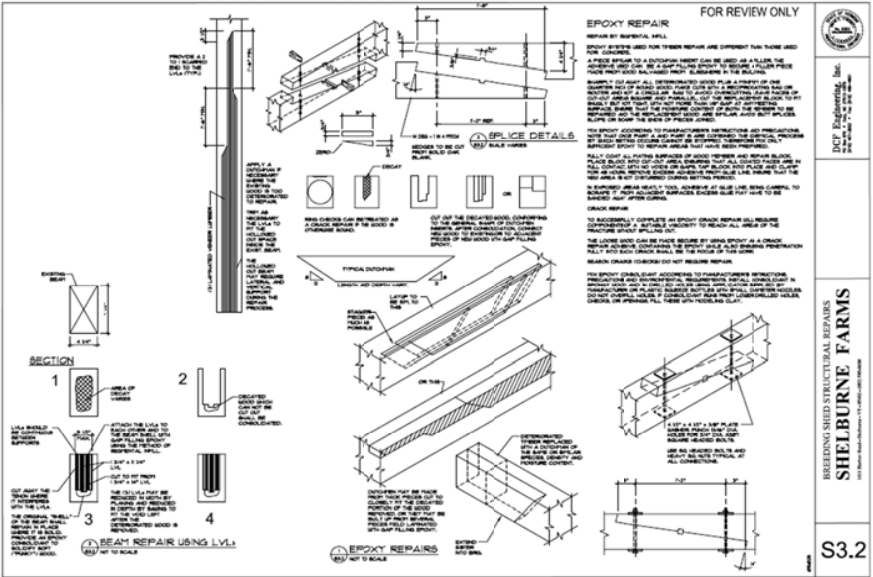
To repair long decay channels, deteriorated wood was removed from the timbers; engineered lumber dutchman repairs were installed in the voids using gap-filling epoxy to adhere the pieces.
